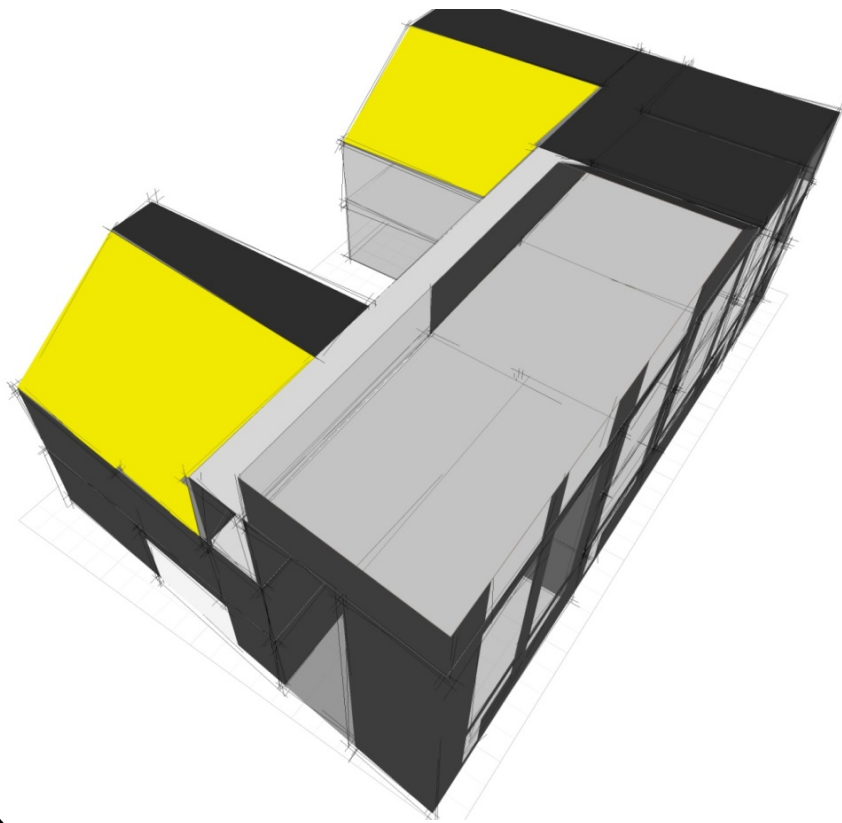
The Places of Solar Panels in a U-shaped Module
